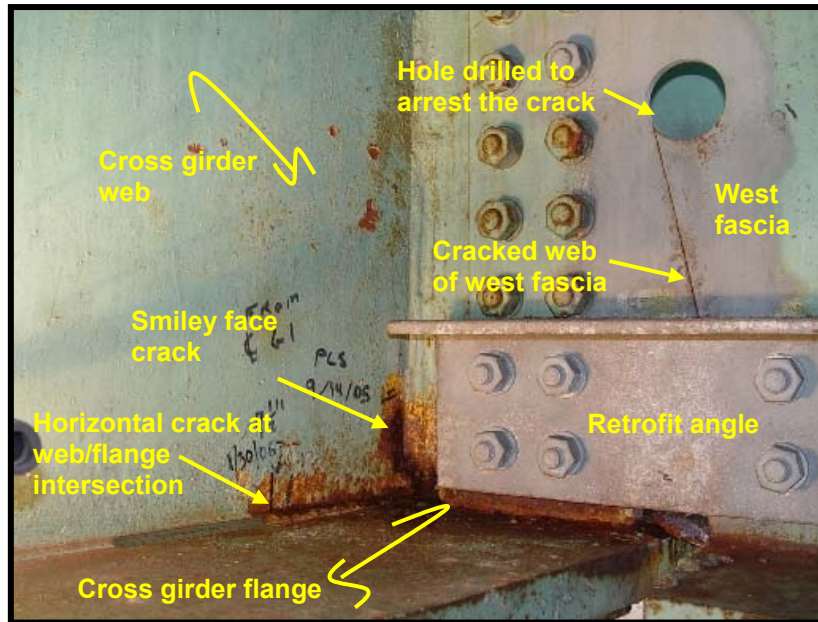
Cracked web of the west fascia stringer (Stringer S7) and cracked web of the cross girder at pier 11
